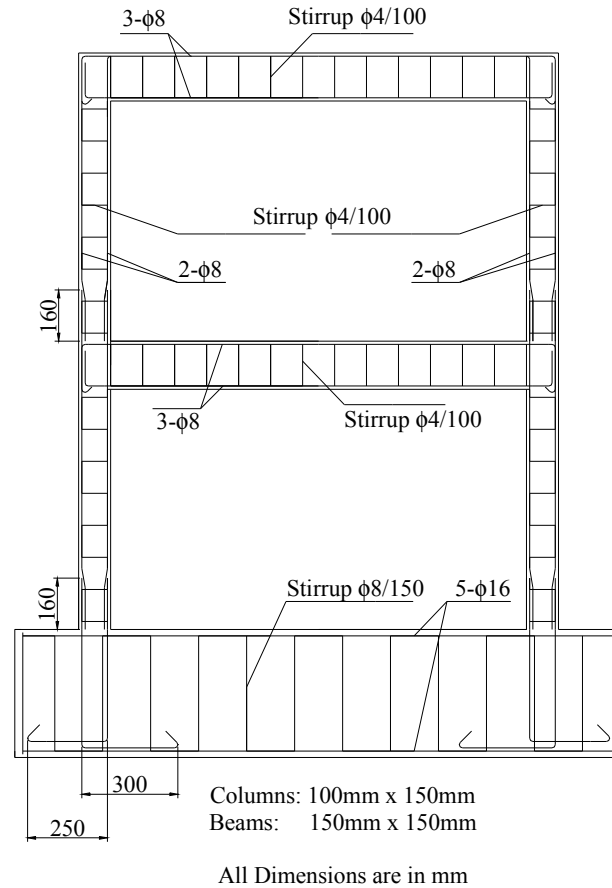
Reinforcement pattern with lapped-splice longitudinal reinforcement
